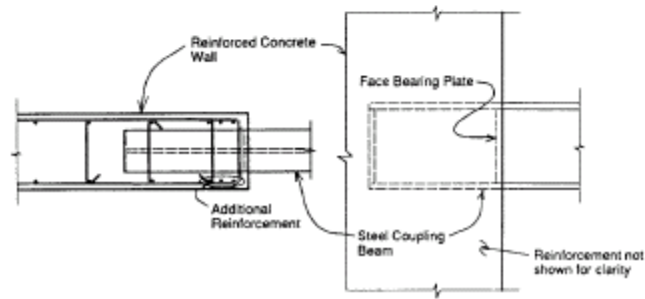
Steel coupling beam to reinforced concrete wall.
